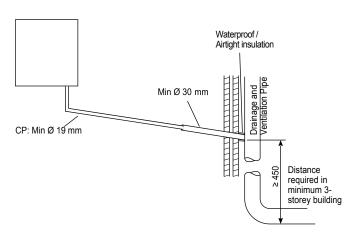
Connection of Condensation Drainage to Drainage and Ventilation Pipe
